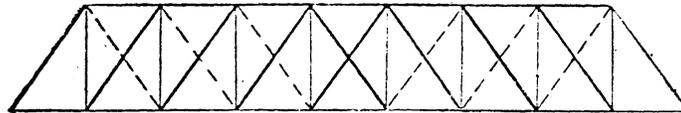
William Howe's timber and wrought iron truss patented in 1840. (From Bridge Engineering, James A. L. Waddell, p. 473.)
